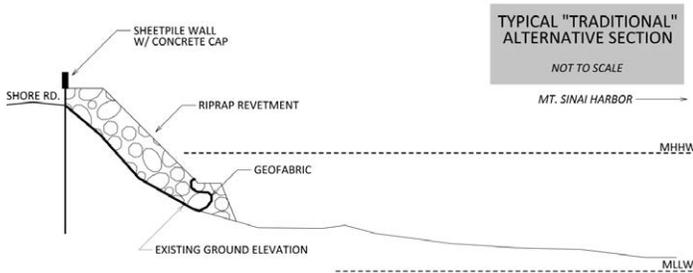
Diagram of traditional roadway embankment armoring and flood protection.
